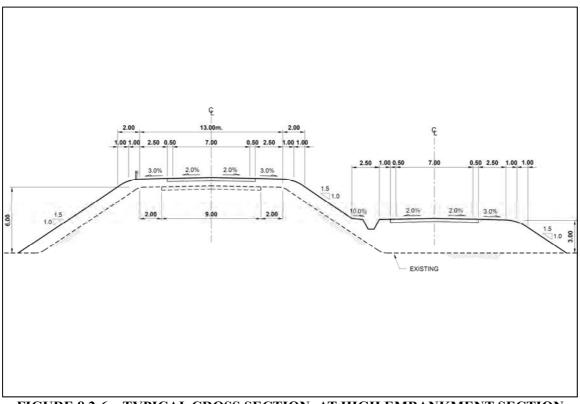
TYPICAL CROSS SECTION: AT HIGH EMBANKMENT SECTION
